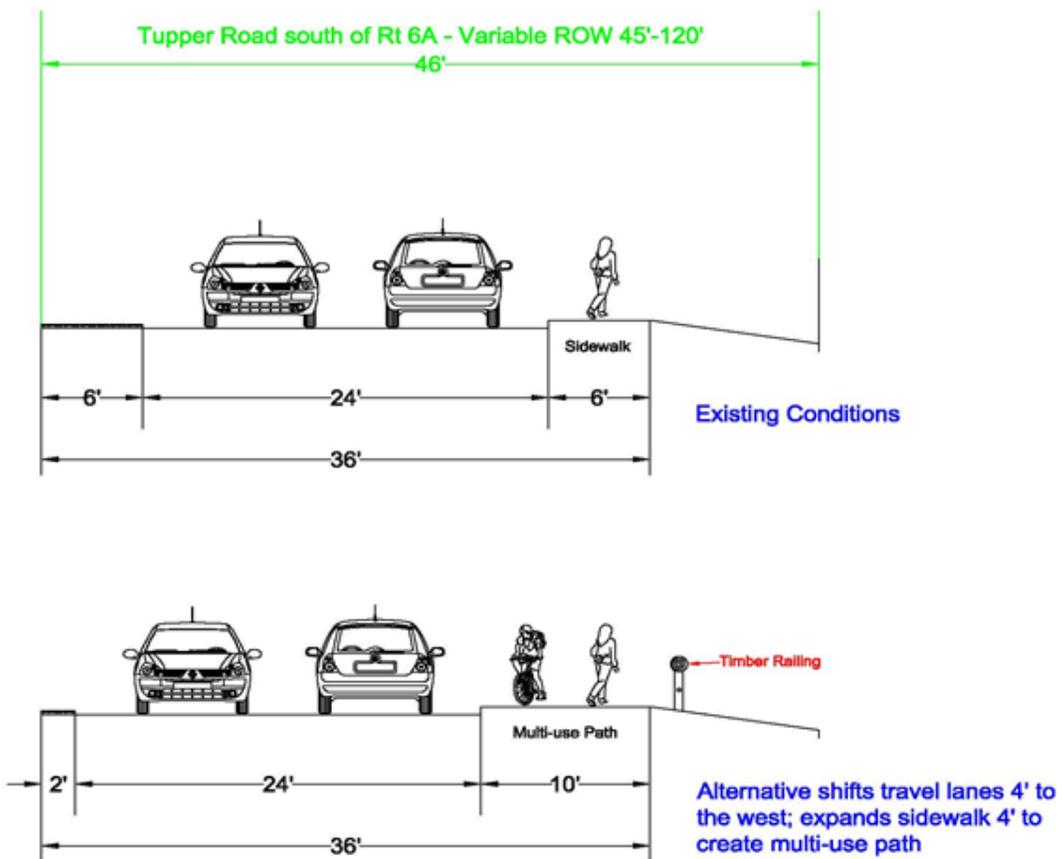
ALIGNMENT D - SITE VIEW AND CROSS-SECTIONS
